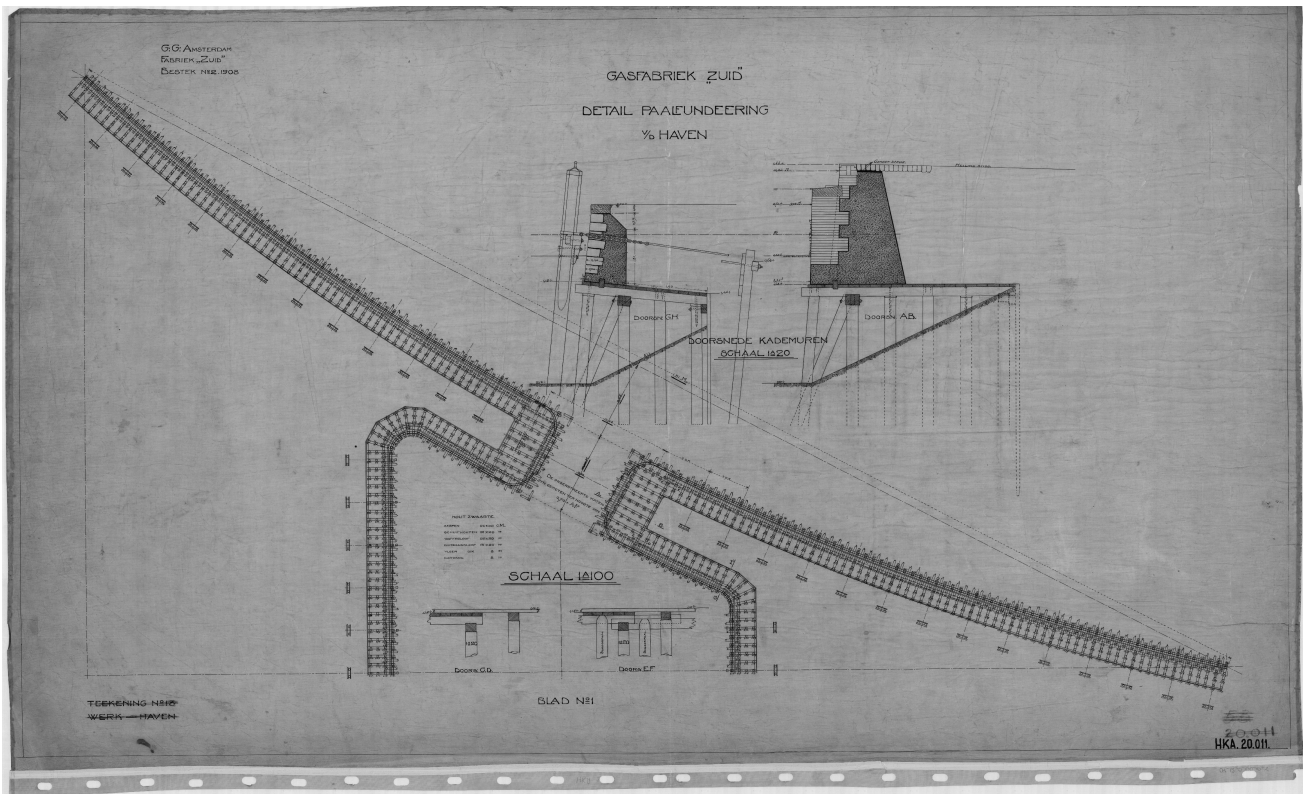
Design plan Quay wall Amsterdam, part 2 (Gemeente Amsterdam, 2021)
